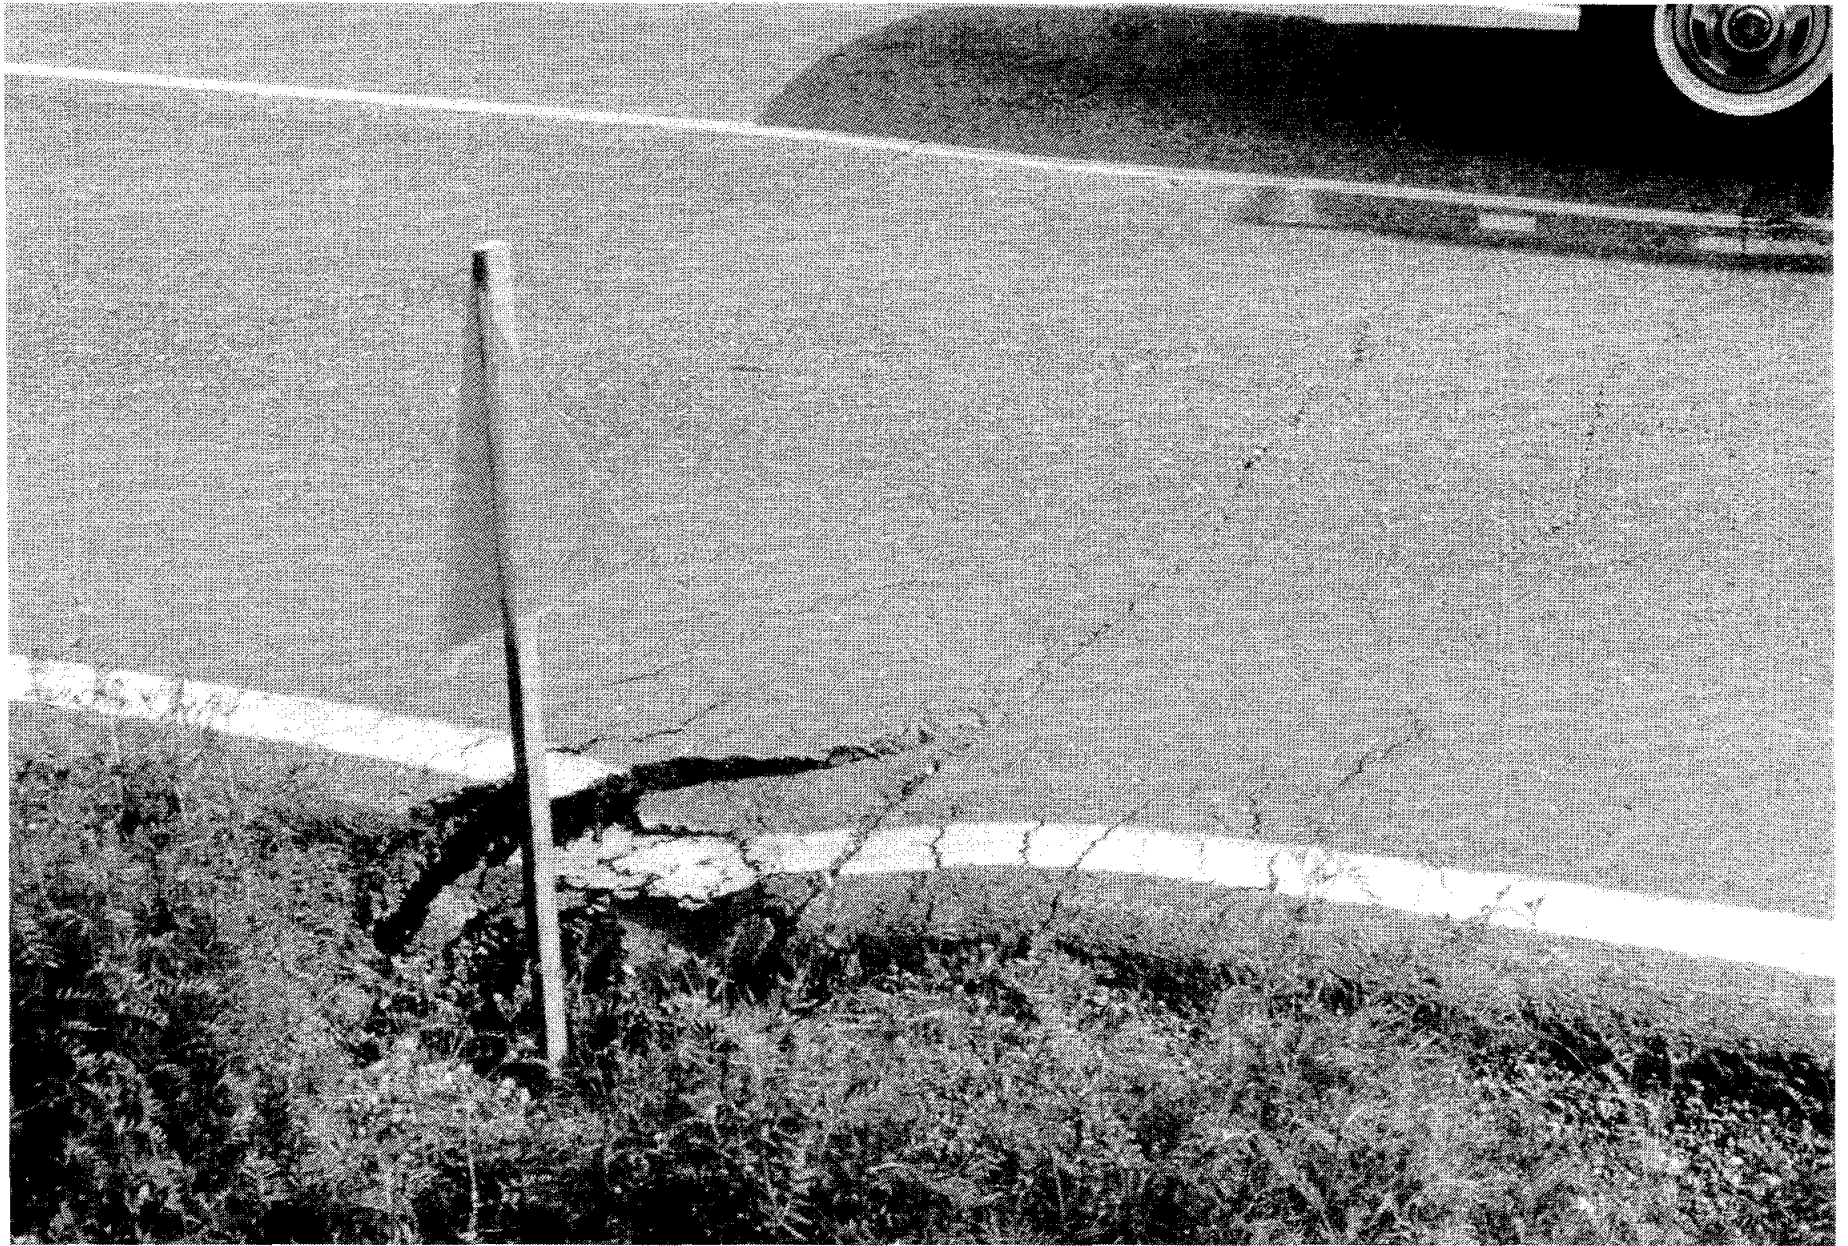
Cracks and associated damage to the edge of the pavement.
